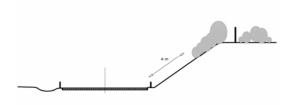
Cross section of the road in a cut without drainage ditch with presented width of mowing.
